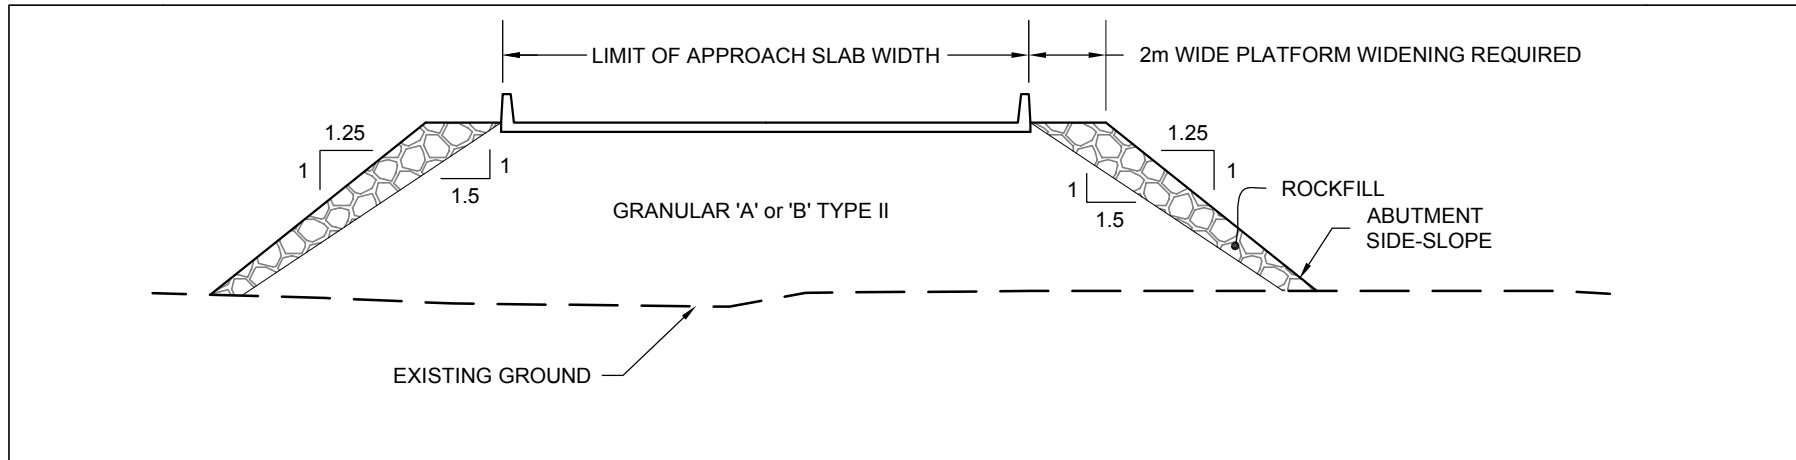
A - TYPICAL SECTION ACROSS APPROACH SLAB
